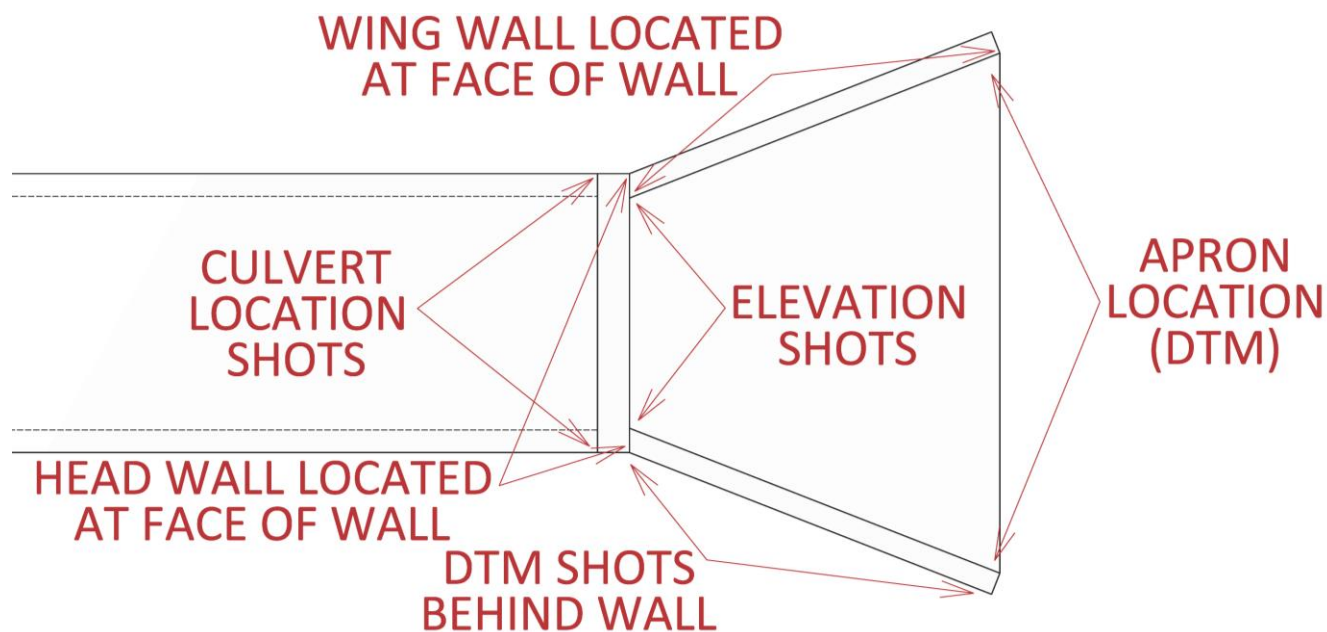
CULVERT SURVEY DETAIL – PLAN VIEW
